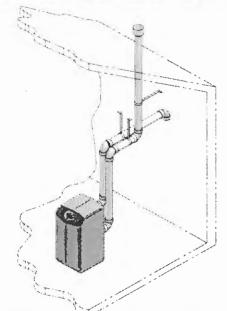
PVC/CPVC Vertical Vent, Sidewall Air - See page 20 for more details
